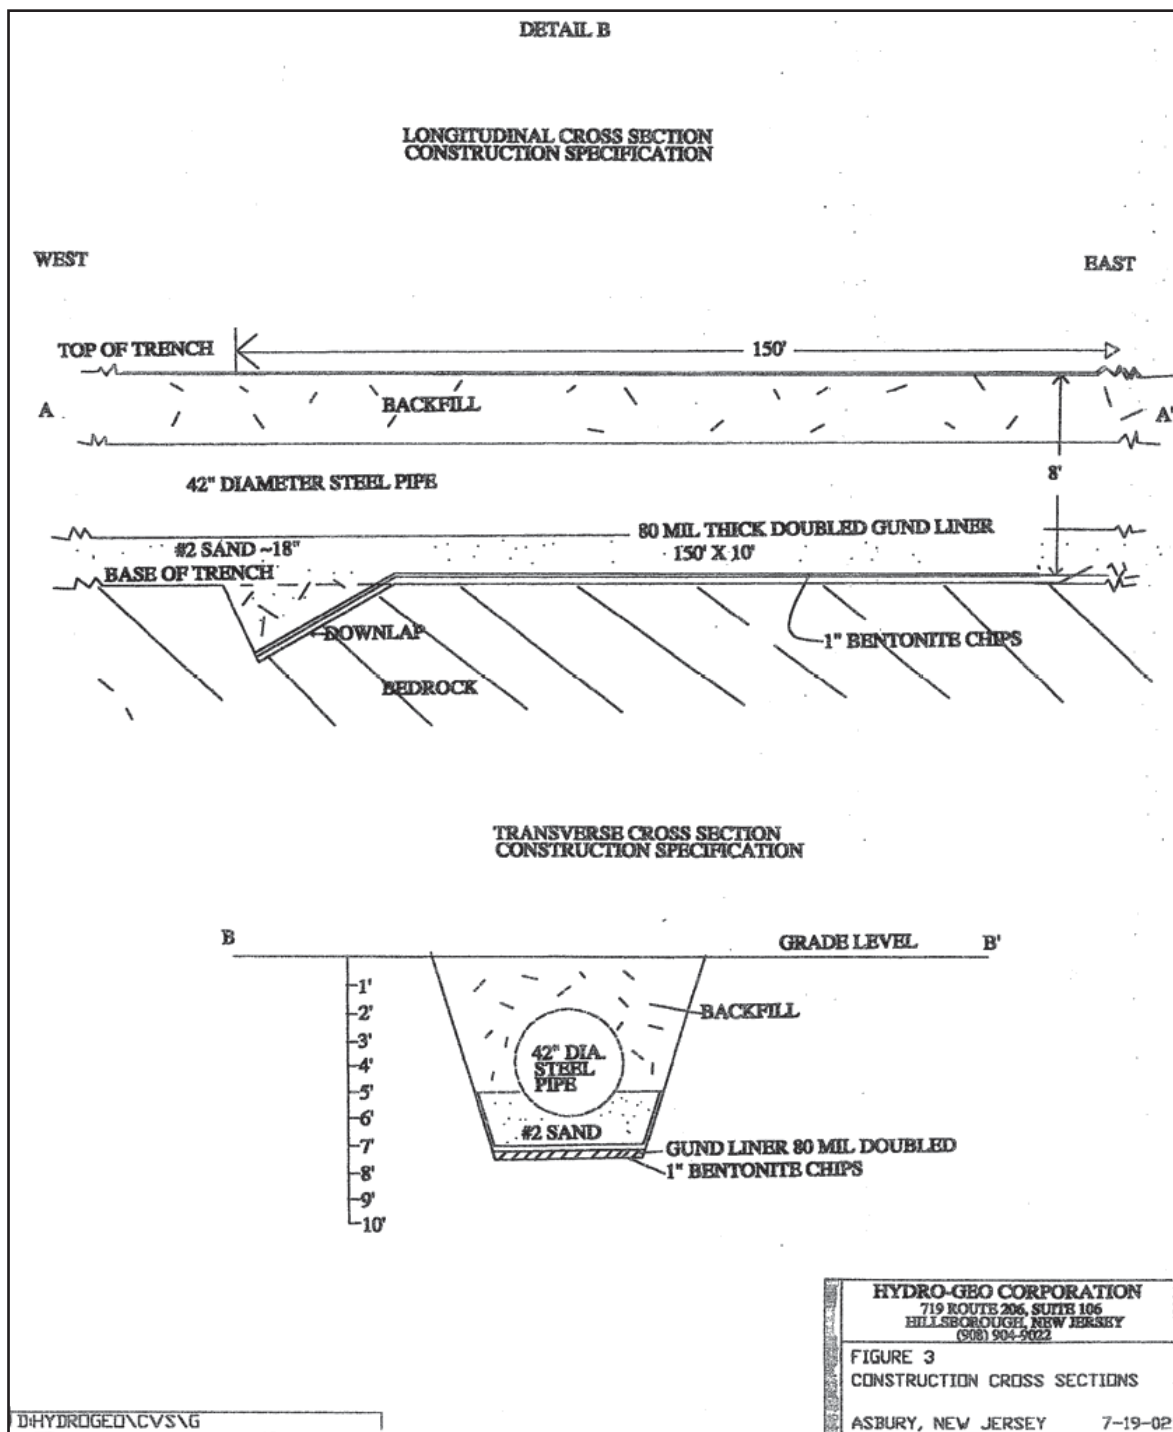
, Construction Cross Sections. Detail B shows sections A-A' and B-B'.
